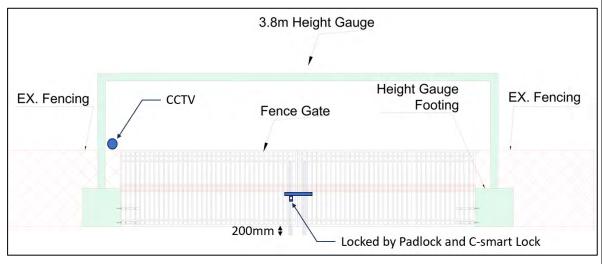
Arrangement for Height Gauge, Access Gate, Level Crossing for Each Site
